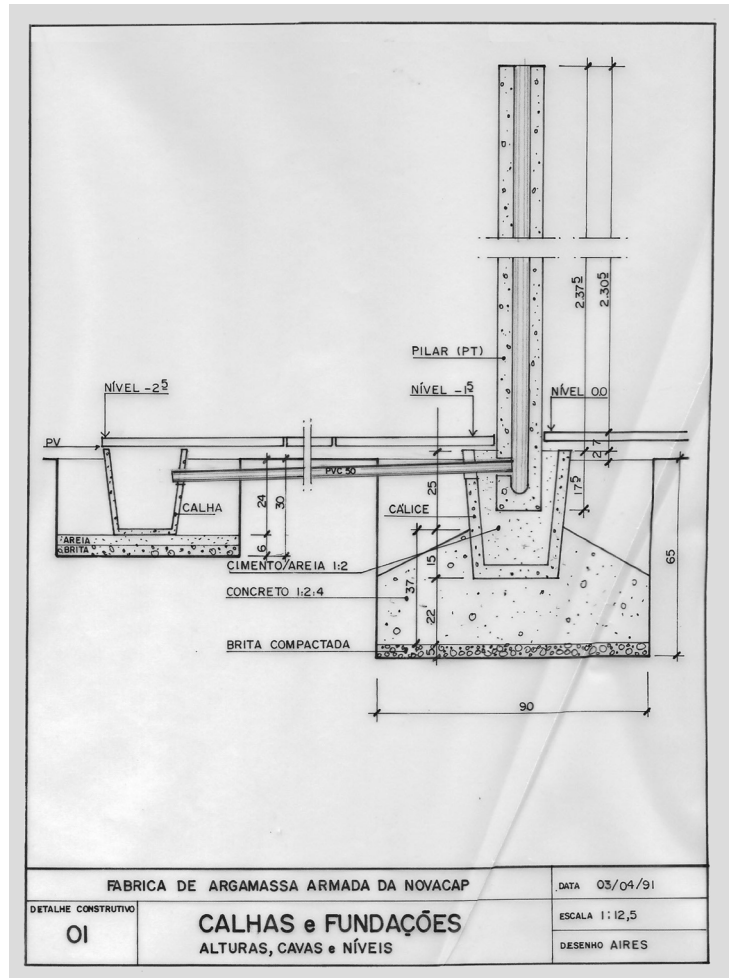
Cross section of the chalice-shaped foundation element and its connection with the precast drainage gutter. Drawing by Aires Carvalho. Constructive detail no. 1, *Calhas e fundações*, April 3, 1991. Arquivo Aires Carvalho, Brasília
